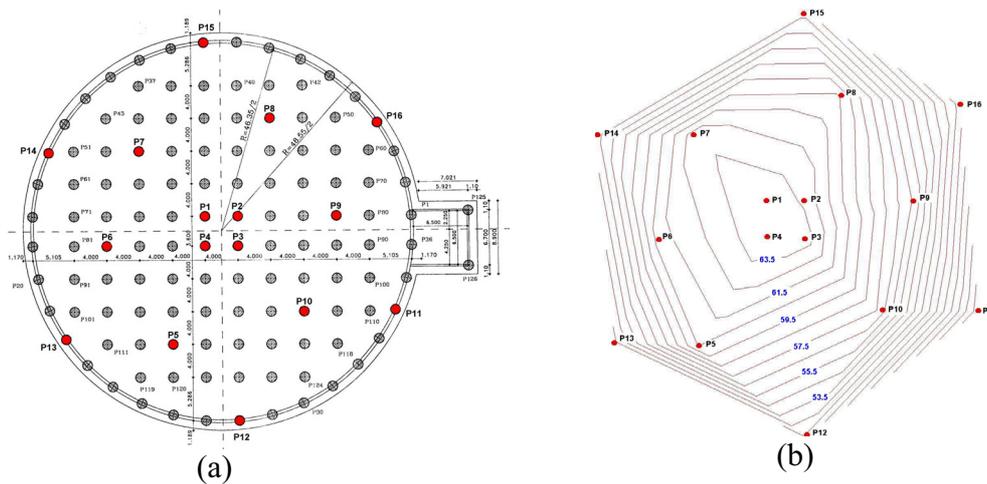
Layout of foundation piles (a) and measured vertical displacements (b) of the 50,000 t sugar storage tank at Plati
